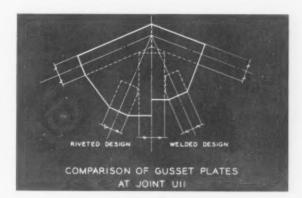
Comparison of weights of this joint for riveted and welded designs showed a 6 ton saving for the latter.
